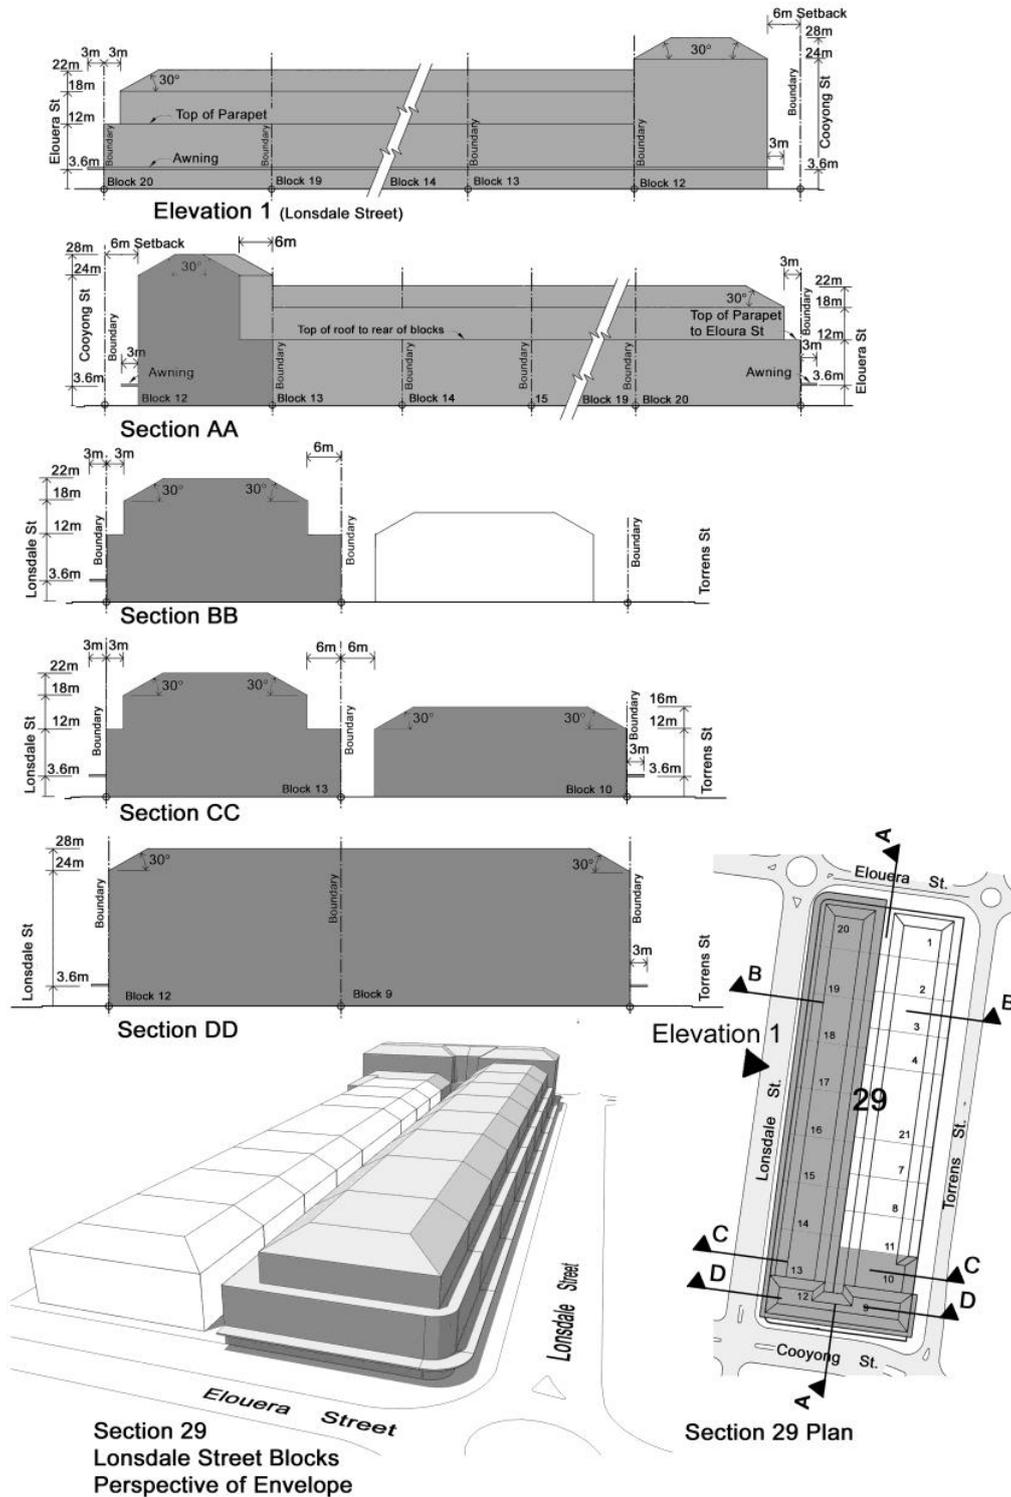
Braddon – Building Envelope (Blocks 9, 10 and 12 to 20 Section 29)
